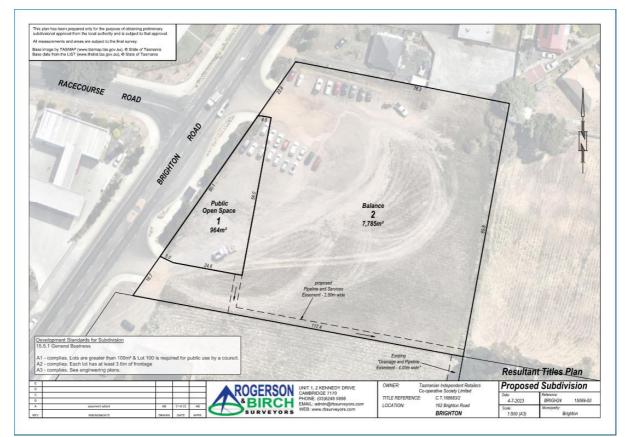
Proposed Plan of Subdivision (Rogerson & Birch, 2023).
